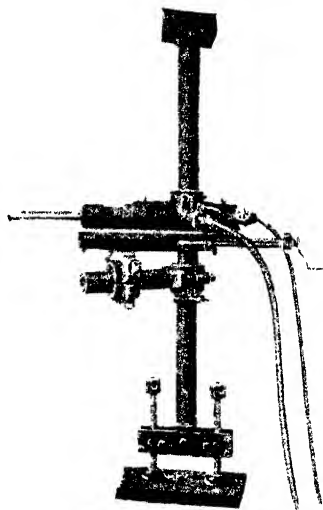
Water Leyner Rock Drill, Model 5, mounted on tunnel column.
